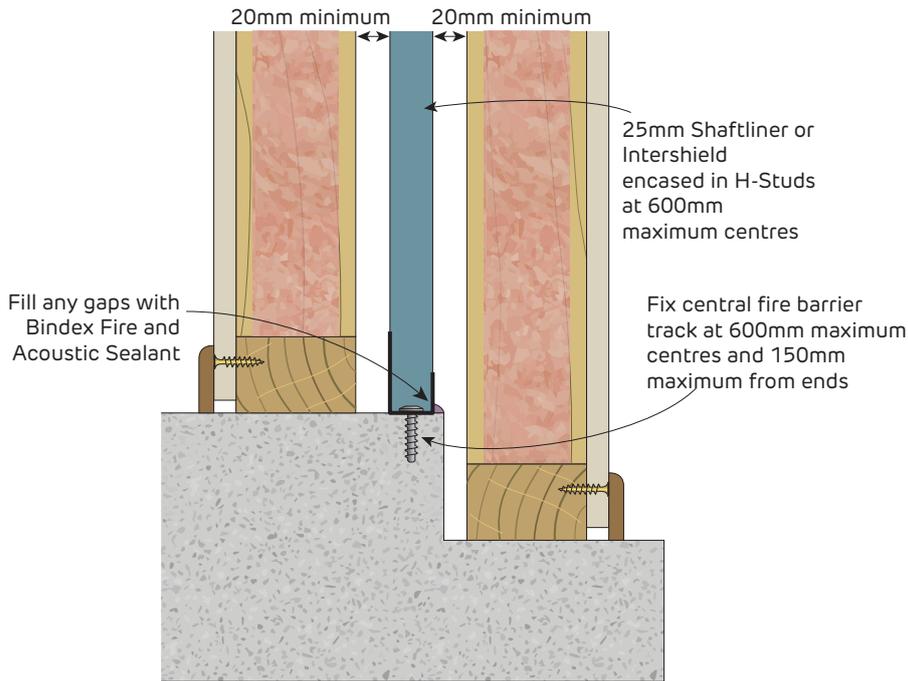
Interhome Wall Base to Slab with Step-Down
